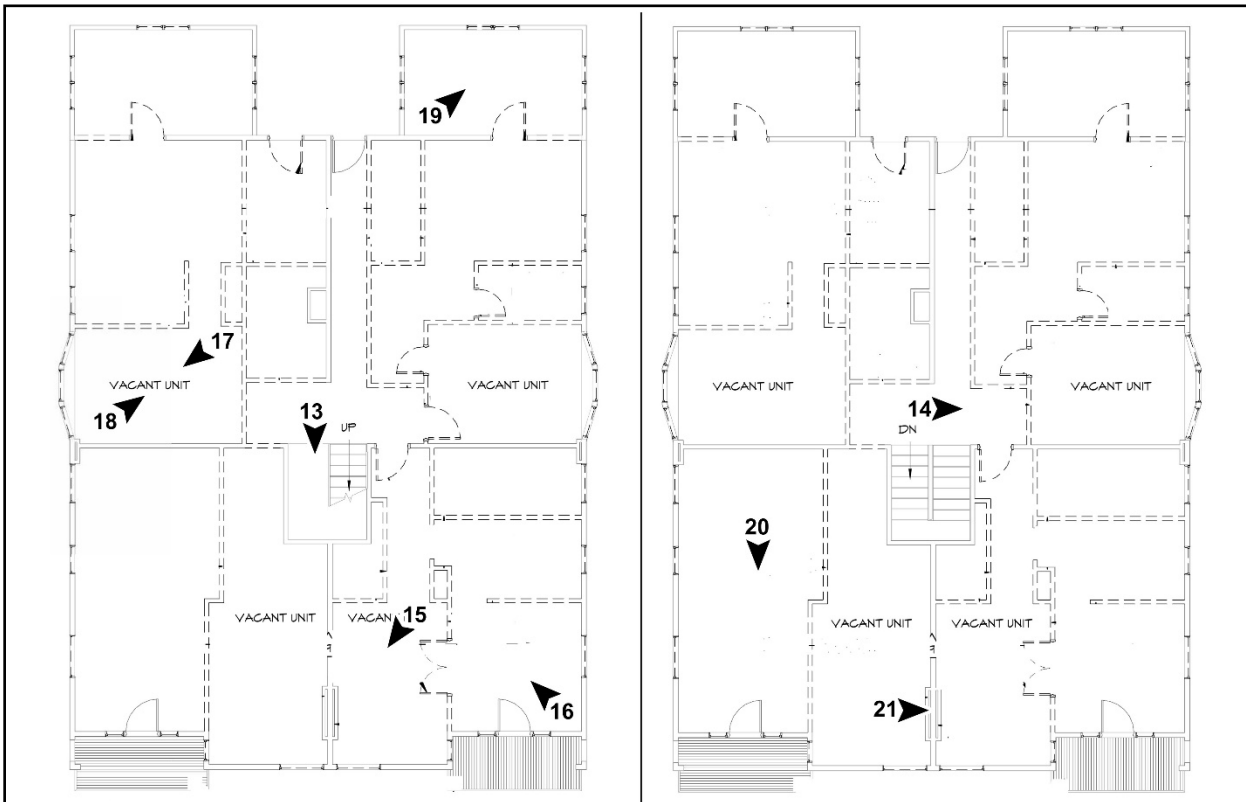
First floor (right) and basement (left) (Drawing from Veritas Architecture + Design, 2023).
